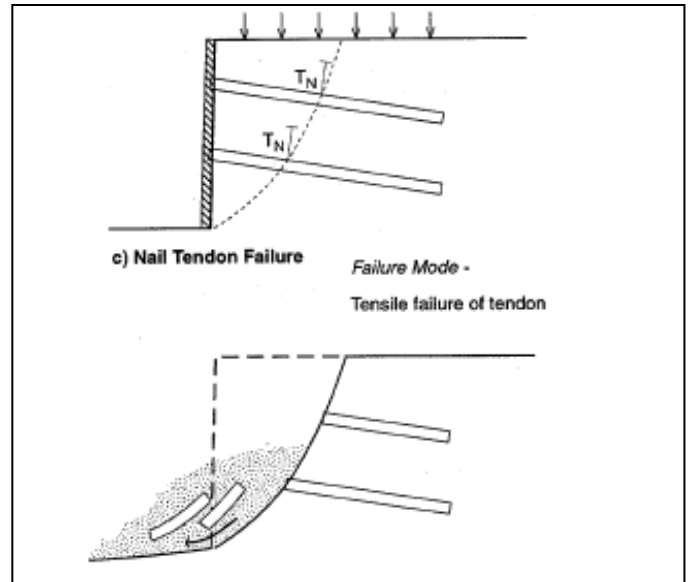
Nail tendon failure mode (FHWA, 1998).
